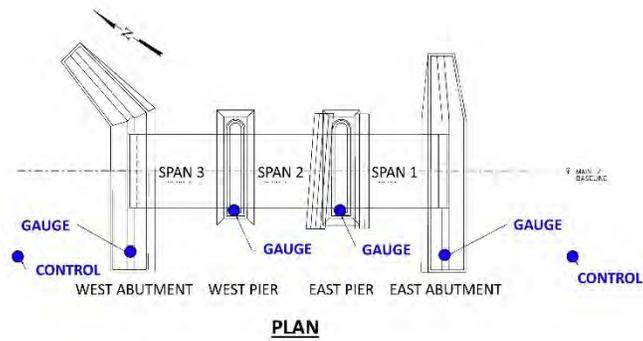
Placement of Settlement Gauges on Piers and Abutments
